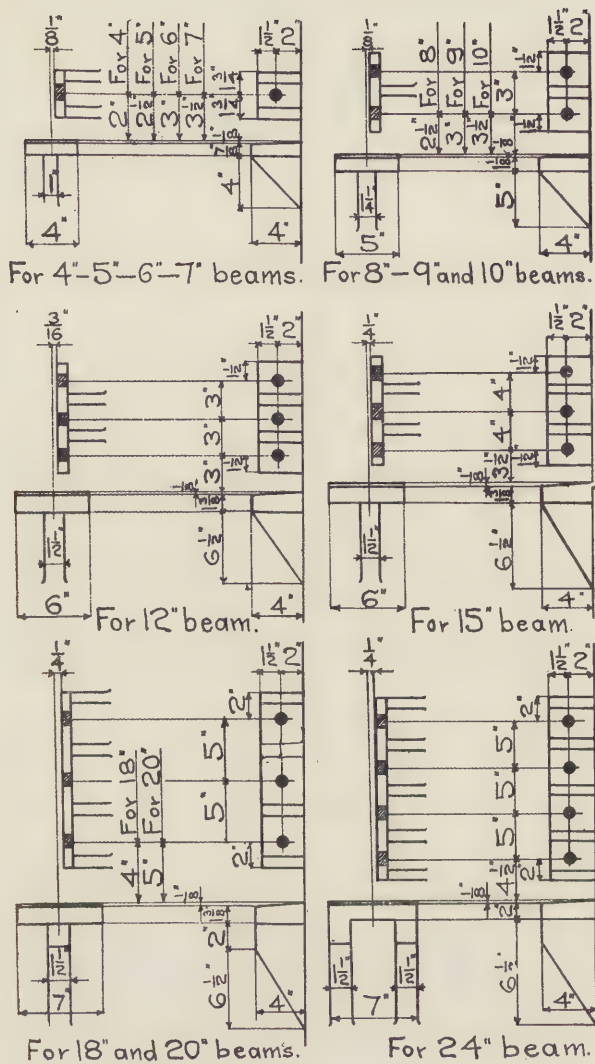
Standard Beam Connections to Cast Iron Columns.
